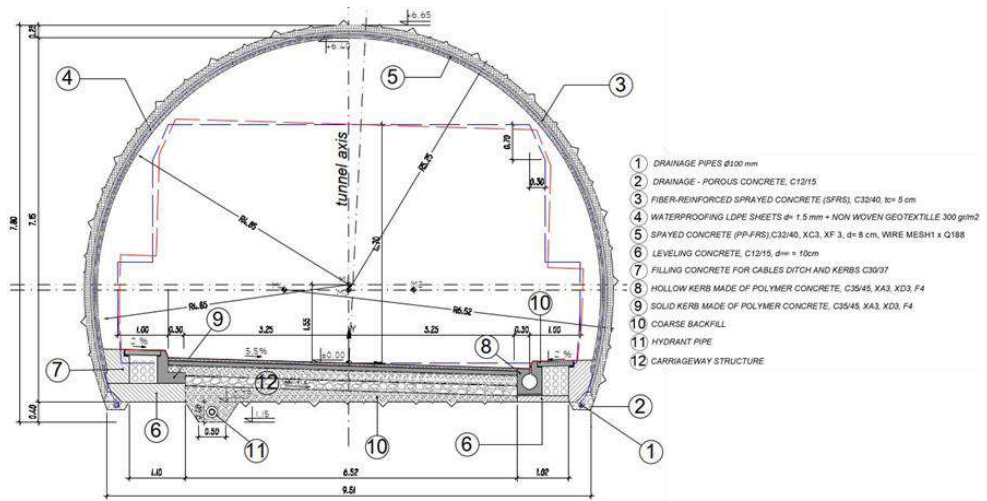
Typical cross-section of the "protective" layer for the tunnel with the single-layer load-bearing lining (Source: Spasojevic, 2022, 2025).
